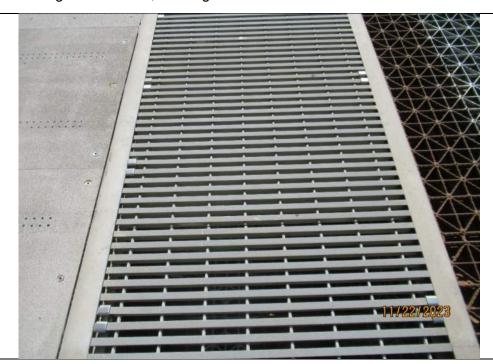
[Span 5] -South leaf NB raised curb, detail view of typical good condition, Looking North
